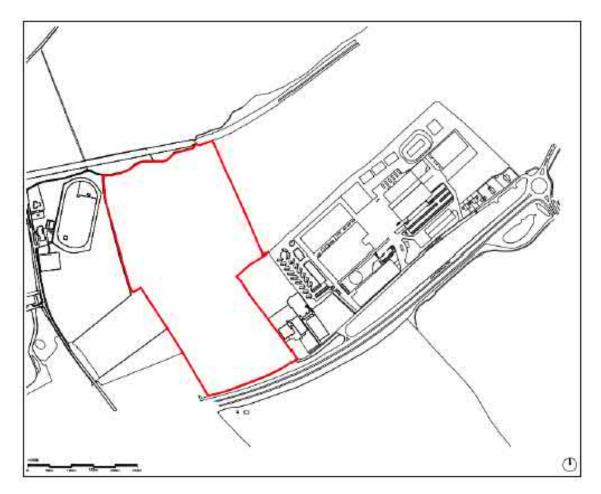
Extract showing extent of site promoted as part of the Local Plan.
